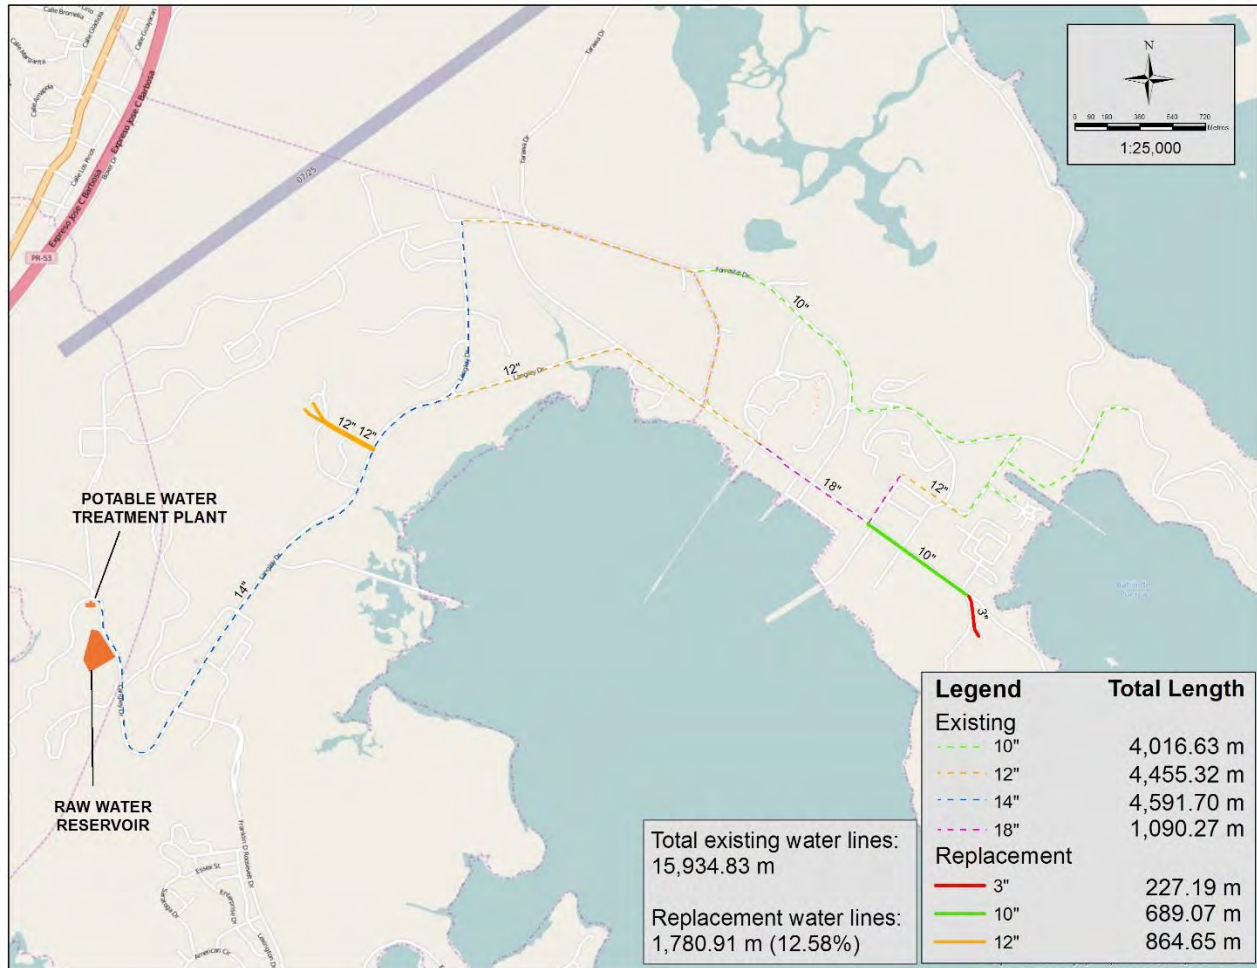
Existing and Proposed Water Distribution System (Alternative 1)
